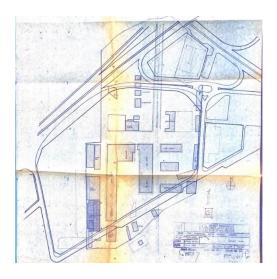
25.04.1983 Site Plan (Source: Sümer Holding)
